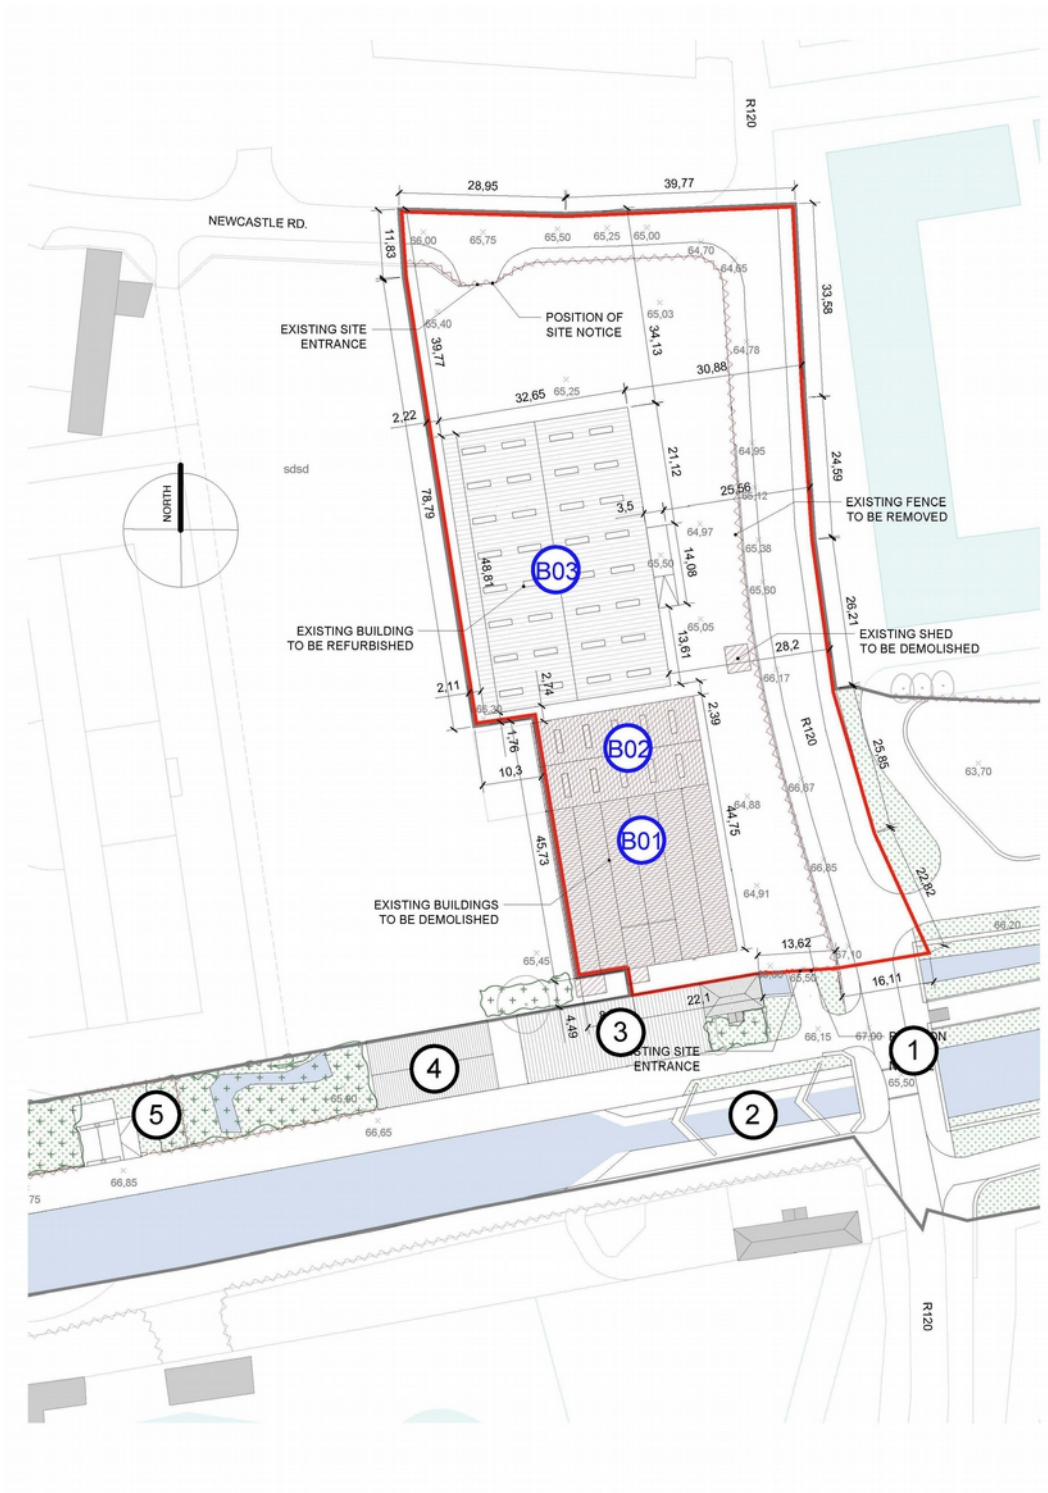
Existing site plan showing the 12th Lock site outline in red. Building B is the proposed development
